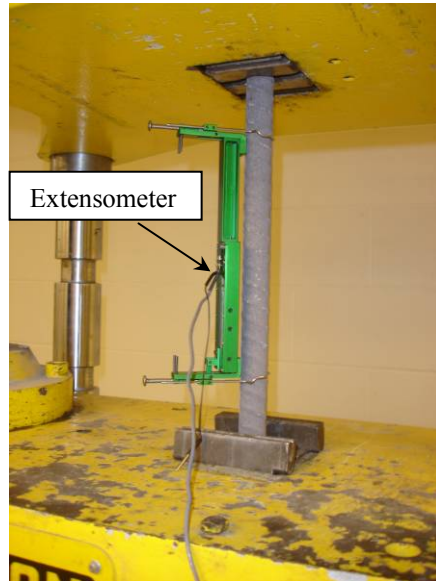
Tensile test setup and instrumentation of reinforcing steel bars.
